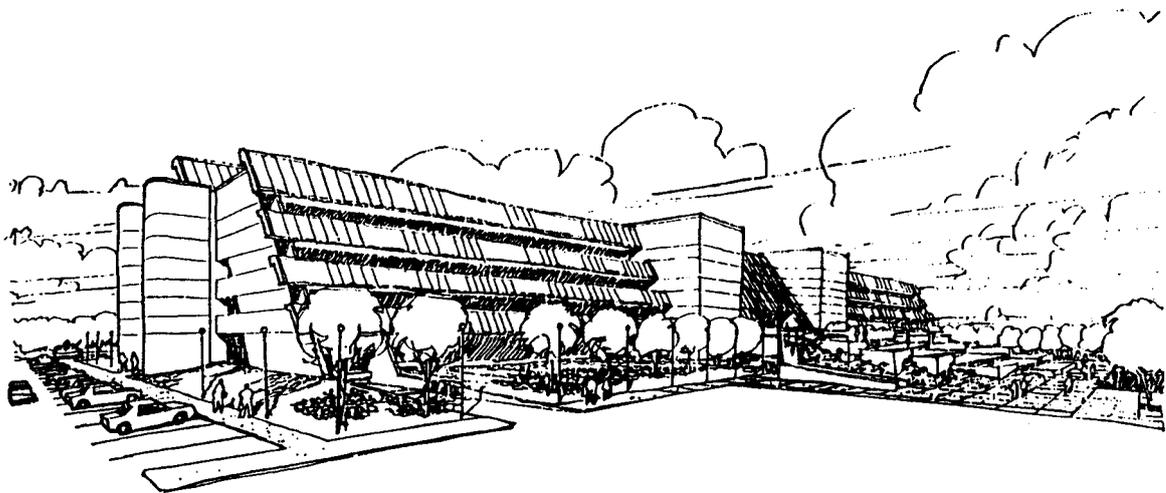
An artist's conception of the facade of the central laboratory building.
